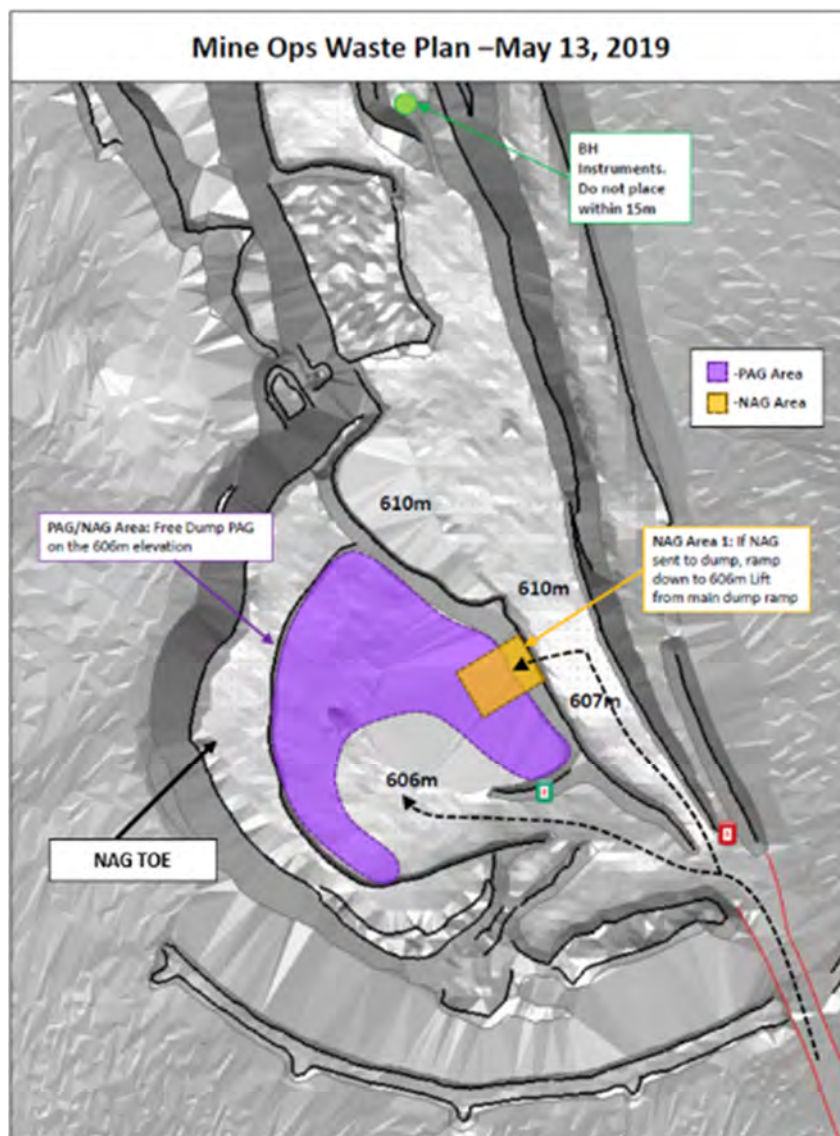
EXAMPLE OF DAILY DUMP PLAN FOR THE WRF
